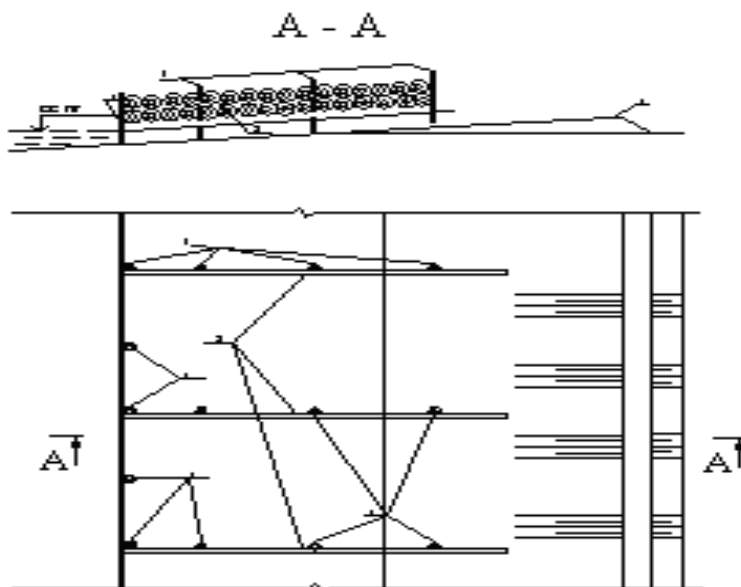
Coastal surge absorber made of typical elements (steel rods embedded in a reinforced concrete base)
